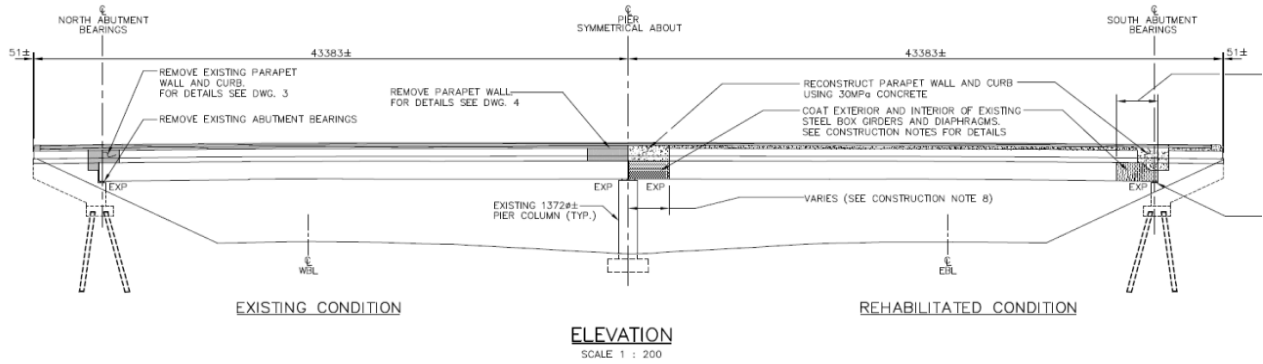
Elevation view of the Camlachie Road Underpass [8]
